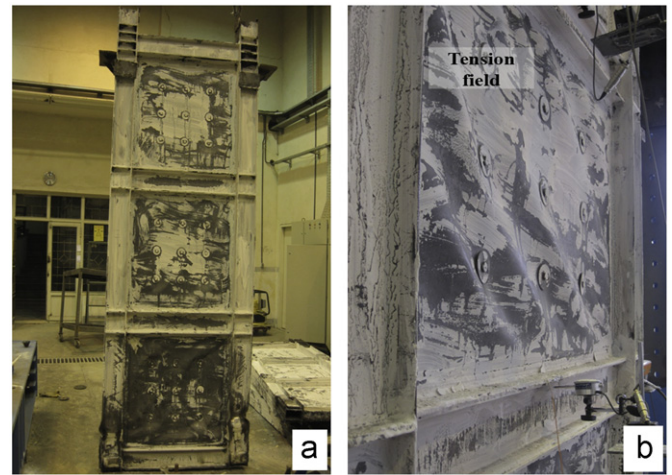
(a) Yielding steel plate panels in the CS3-3 specimen and (b) plate tension-field action between the bolts in the second-story at the CS3-4 specimen.
